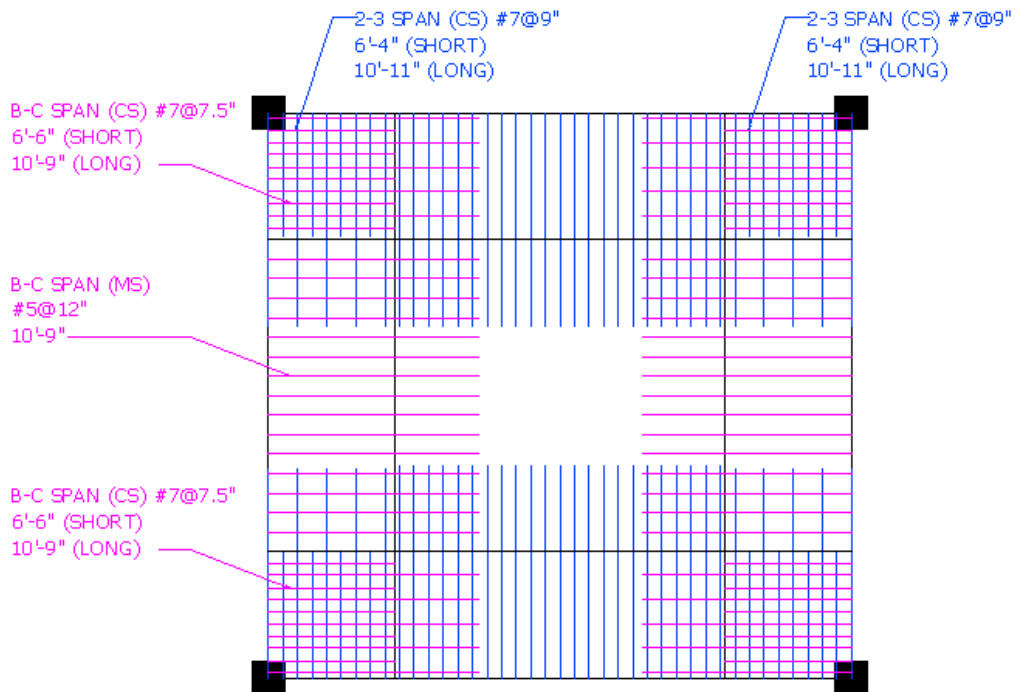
A. Negative Reinforcement Layouts in Bay bounded by Column Lines B and C, 2 and 3
